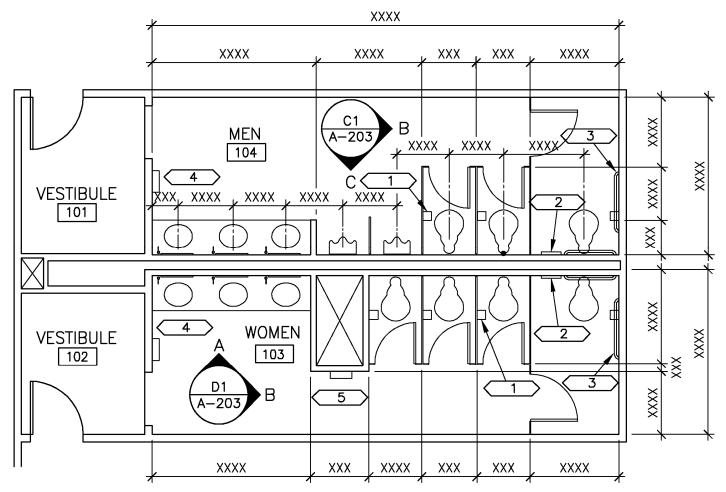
Example of a toilet plan showing dimensioning, accessory identification, and reference to elevation.
